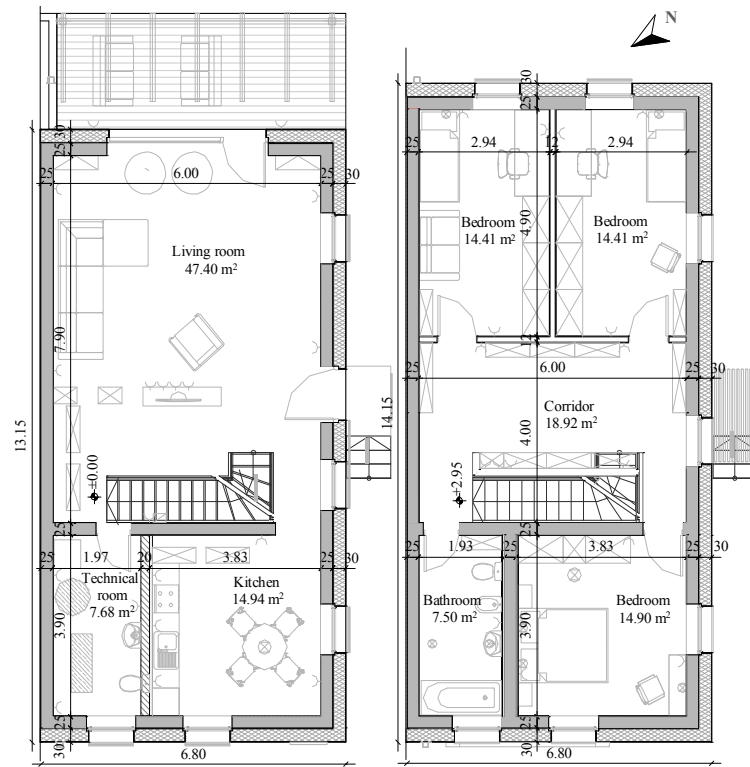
Horizontal architectural plans for the studied house (ground floor, first floor)
